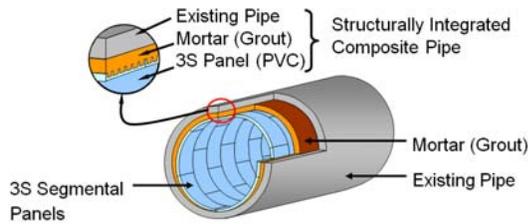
Segmental lining can create a structurally integrated composite pipe consisting of the existing pipe, high strength grout and panels (Kampbell, 2009)
